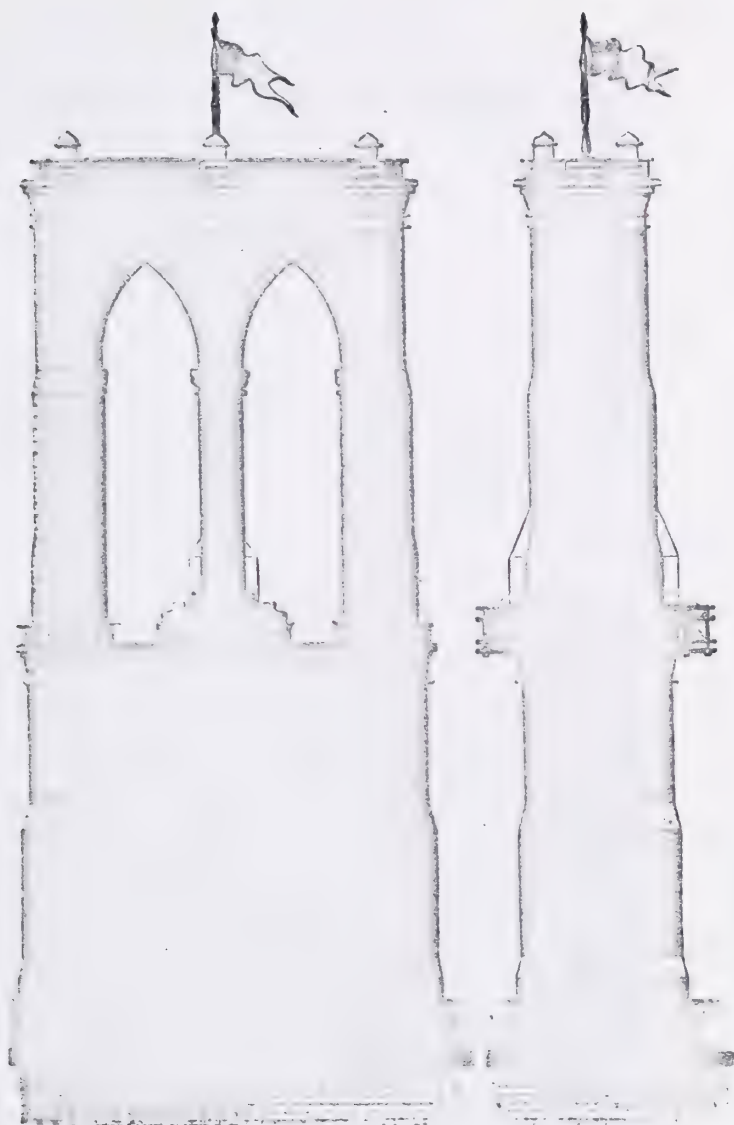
John A. Roebling, DESIGN OF TOWERS FOR
